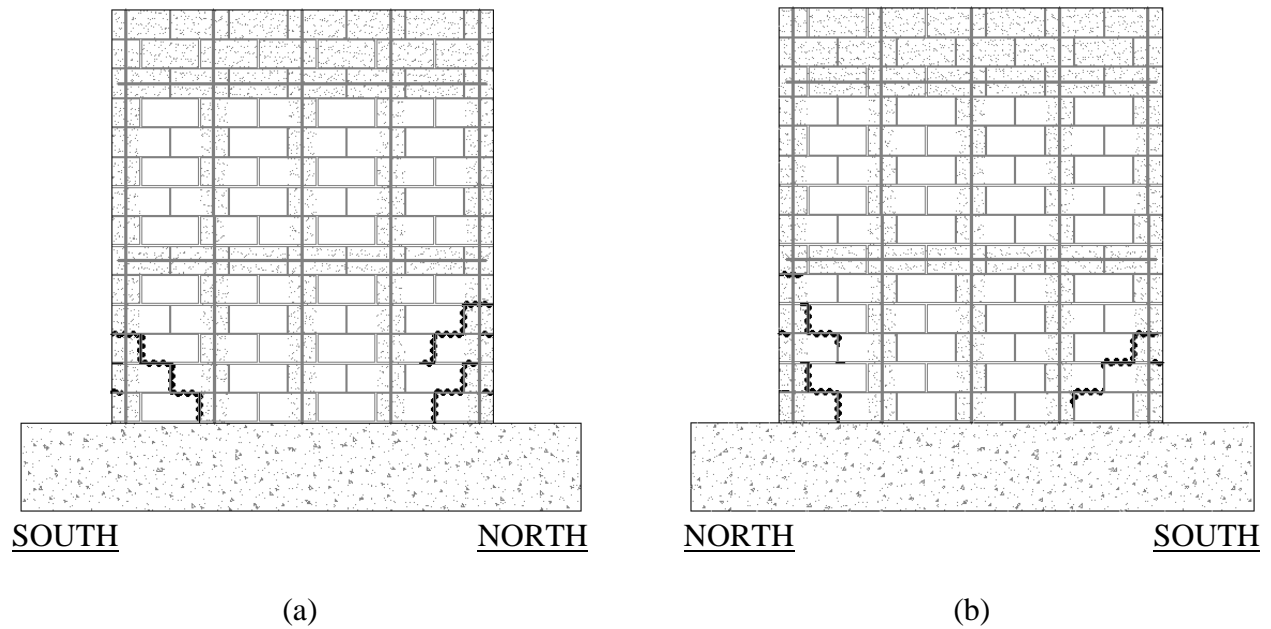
Specimen PG085-24 cracking prior to testing, (a) east face, and (b) west face
